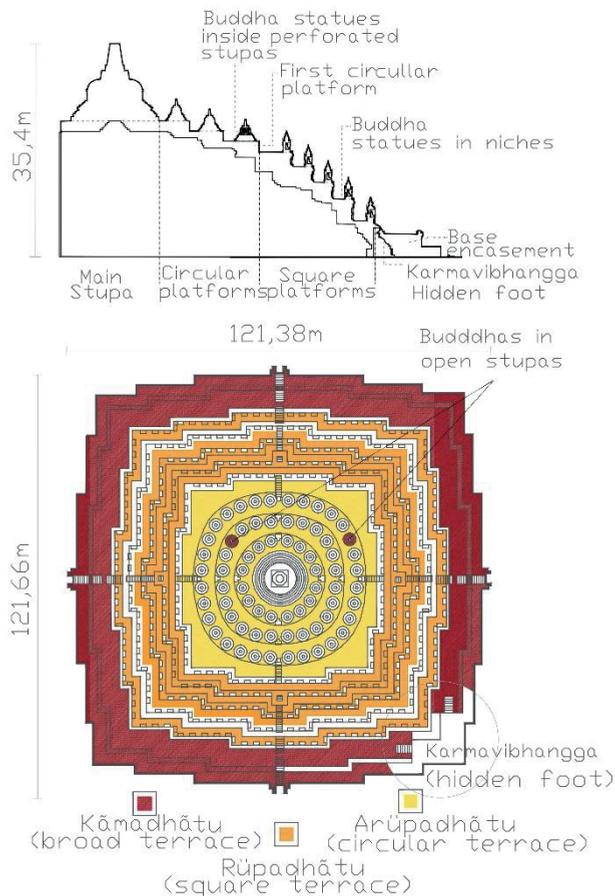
Cross section and plan of the building, Borobudur, Indonesia; based on: Gunawan artapanata, https://commons.wikimedia.org/wiki/File: Borobudur_Cross_Section_en.svg, accessed 14.10.2018
